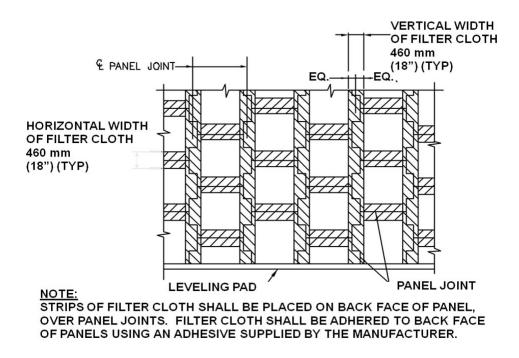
Example layout of filter at joints between segmental precast facing units.
